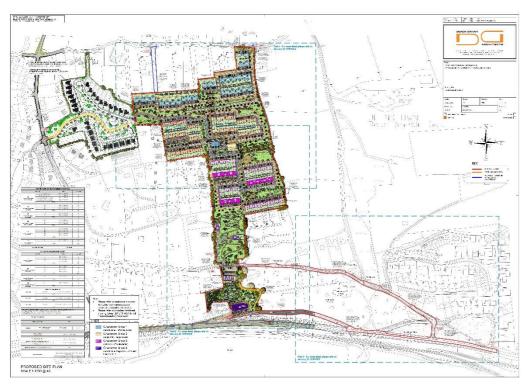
Architects layout (Courtesy: Deady Gahan Architects)
